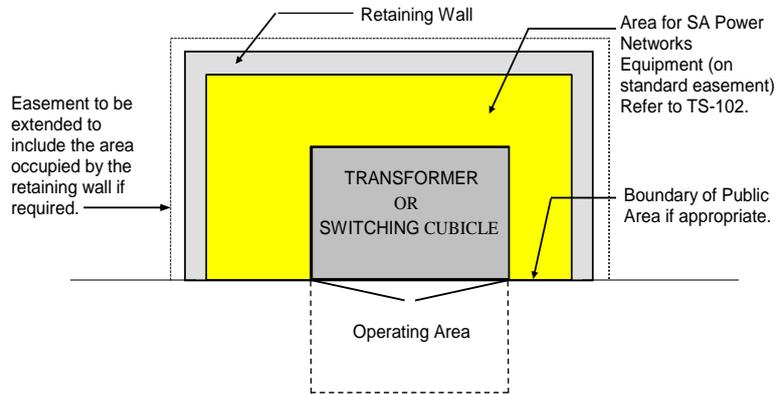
Retaining Wall Area included in Extended (Overall) Easement
